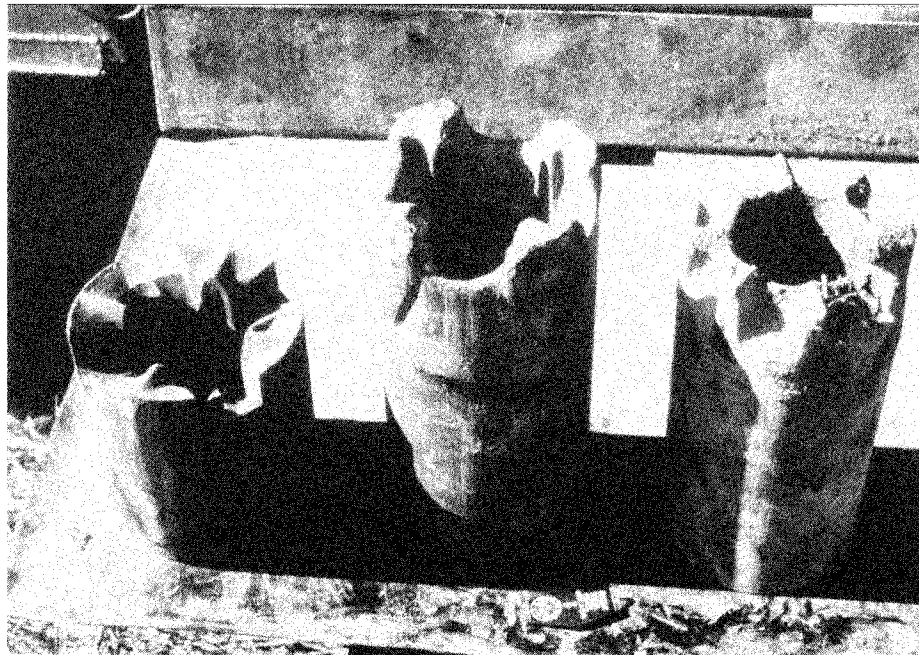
Photograph of several open-type Becker bits (Harder 1993)
